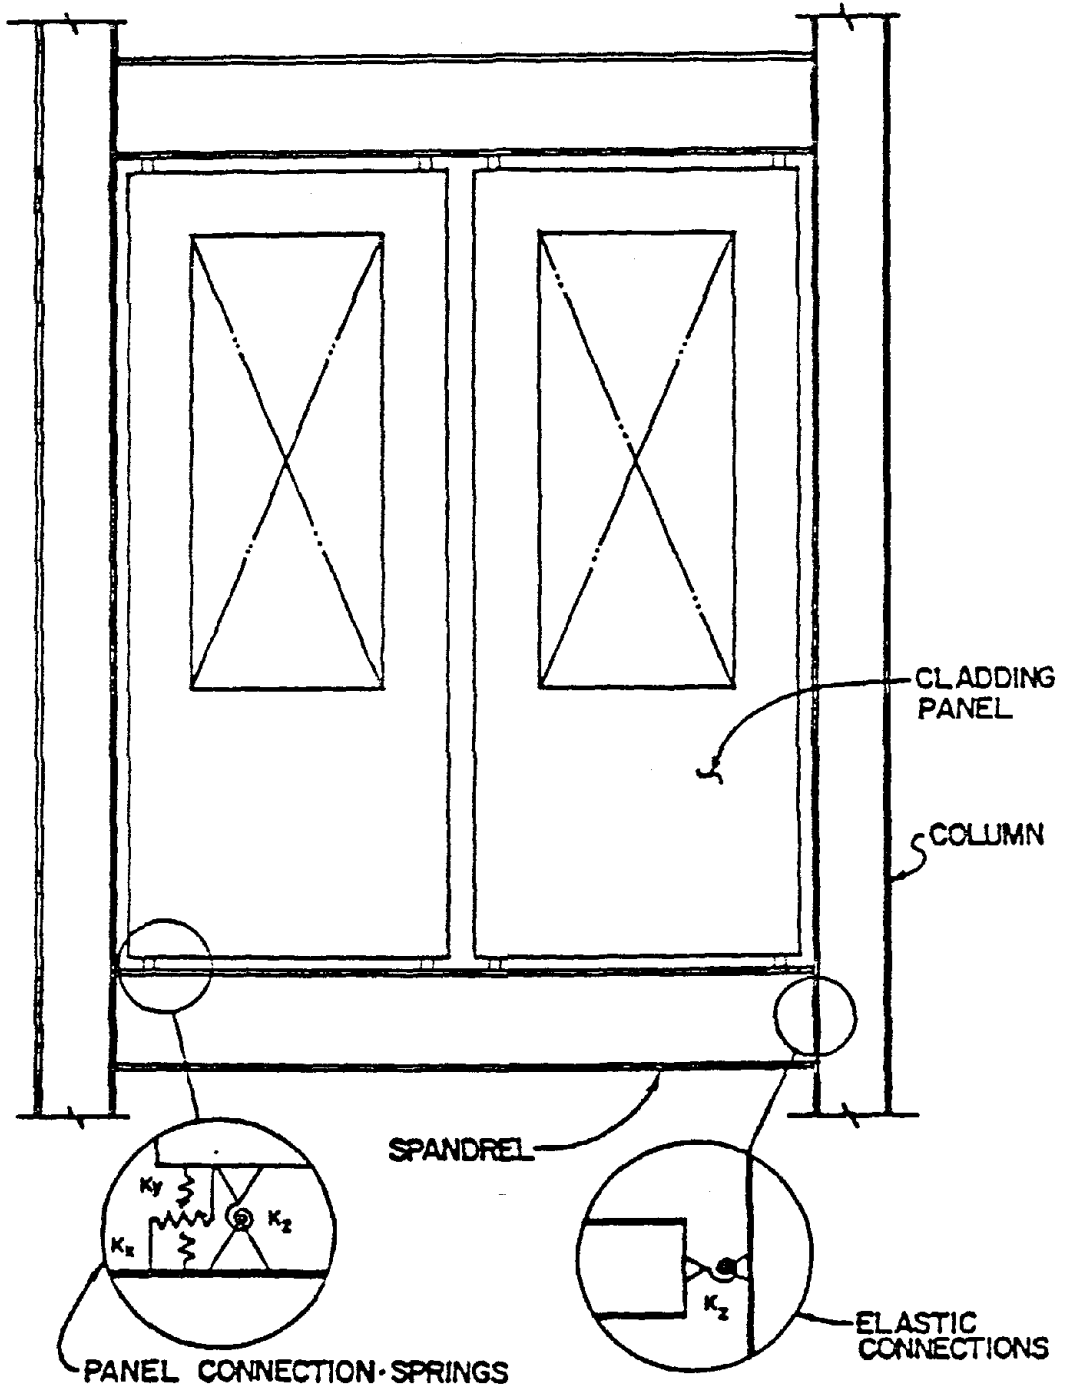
Analytical Model for Typical Portion of Cladding and Exterior Frame.
